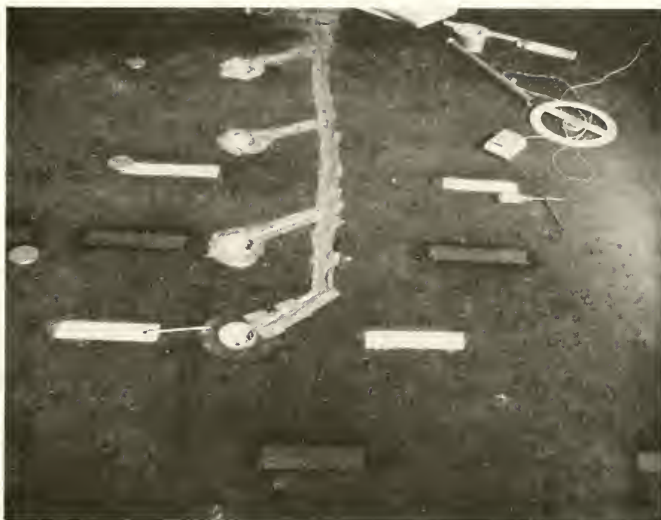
LVDT lead wires are protected by a shallow trench cut into the pavement.
